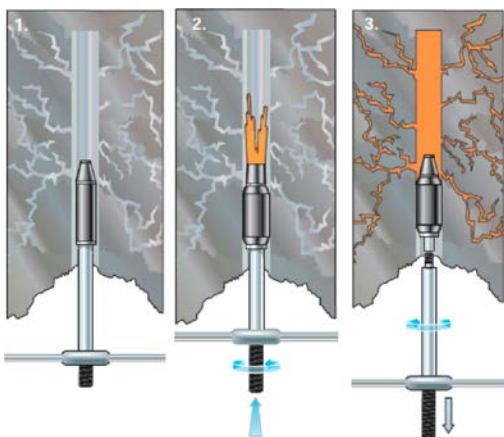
Illustration of the single-use GMA GX packer used in the tunnel grouting.
